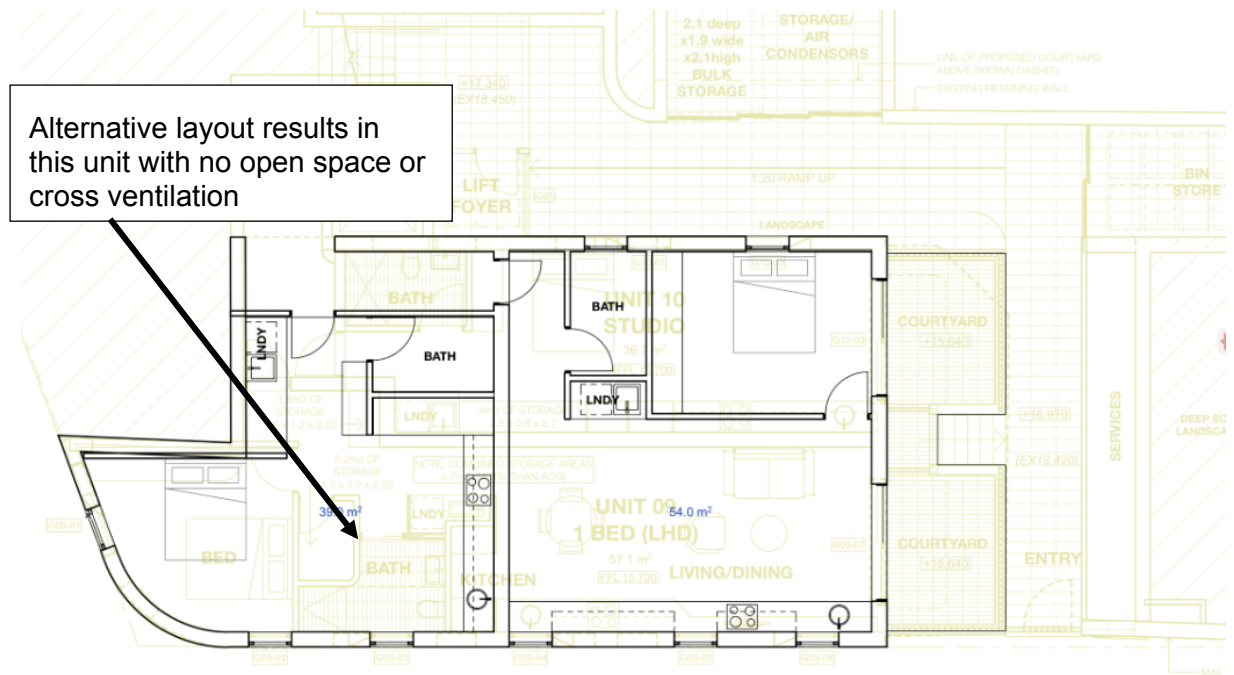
Alternative lower ground floor plan. The unit on the left hand side would not have private open space or cross flow ventilation.
